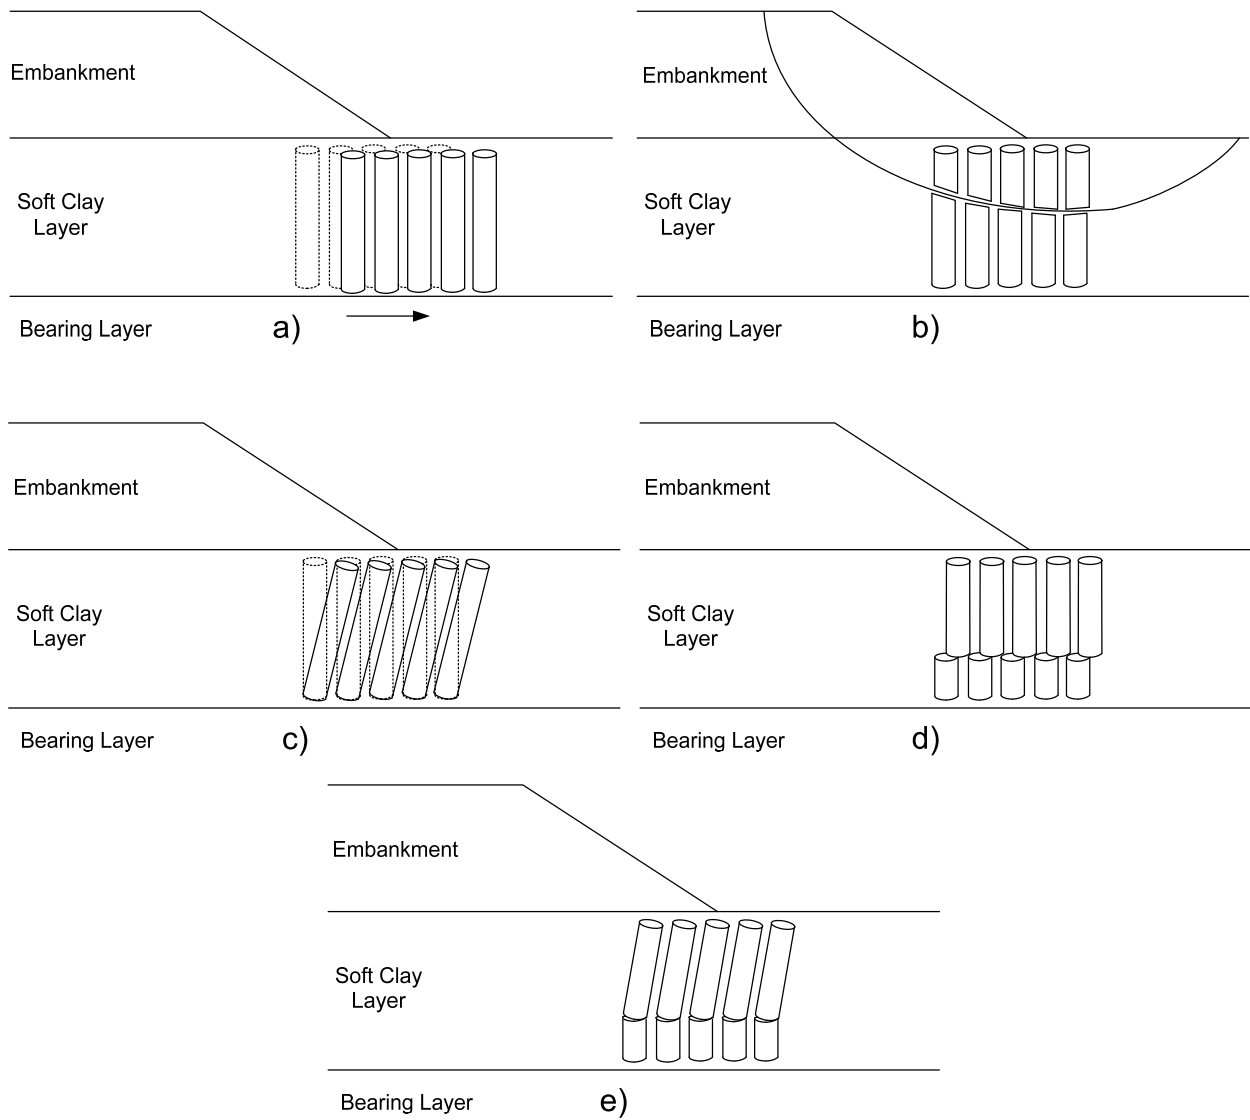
Failure modes in stiff column-supported embankments, a) sliding failure, b) rupture breaking failure, c) racking failure, d) shear failure, e) bending failure (after Kitazume 2008).
